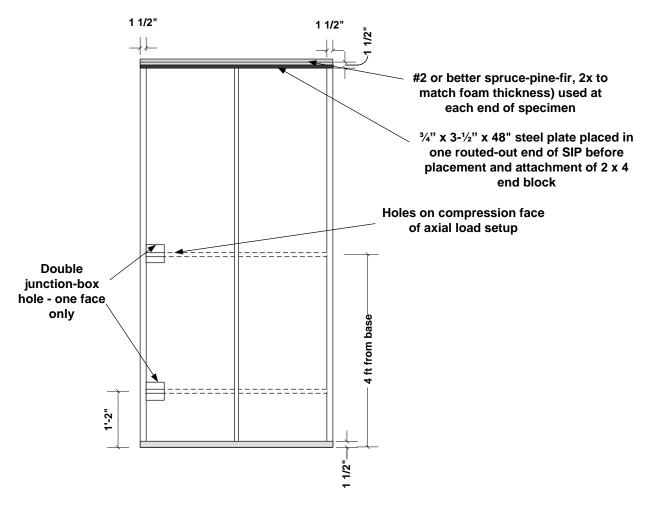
AXIAL (COMPRESSIVE) LOAD TEST SPECIMENS
